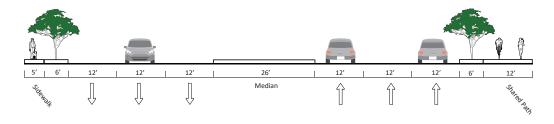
Major Arterial Cross-Sections Source: GCMPO
